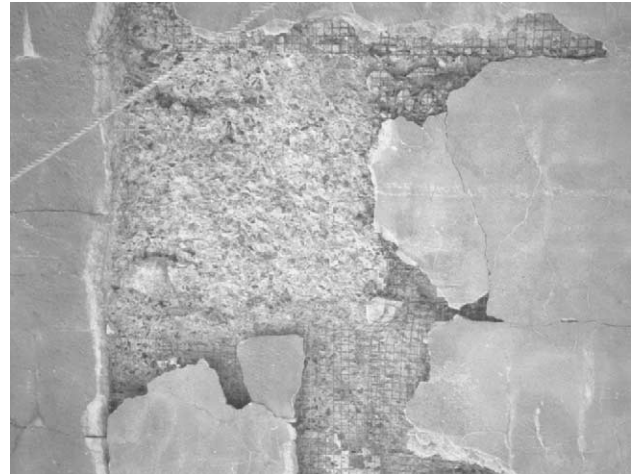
Photograph of poorly bonded repair concrete and typical large cracks of damaged Wharf B4.
